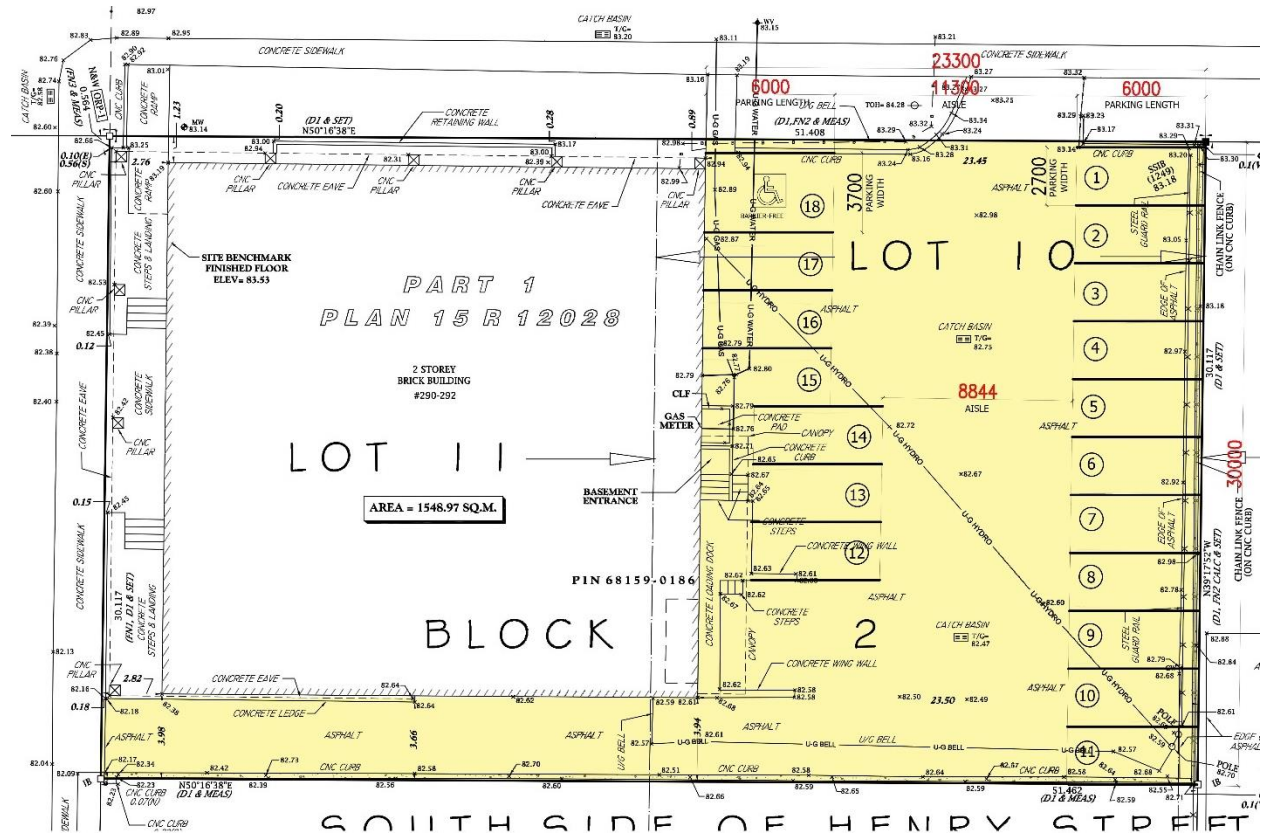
Extracted from Site Survey & Site Plan. Illustrating the Existing parking, and private lane highlighted in yellow.
